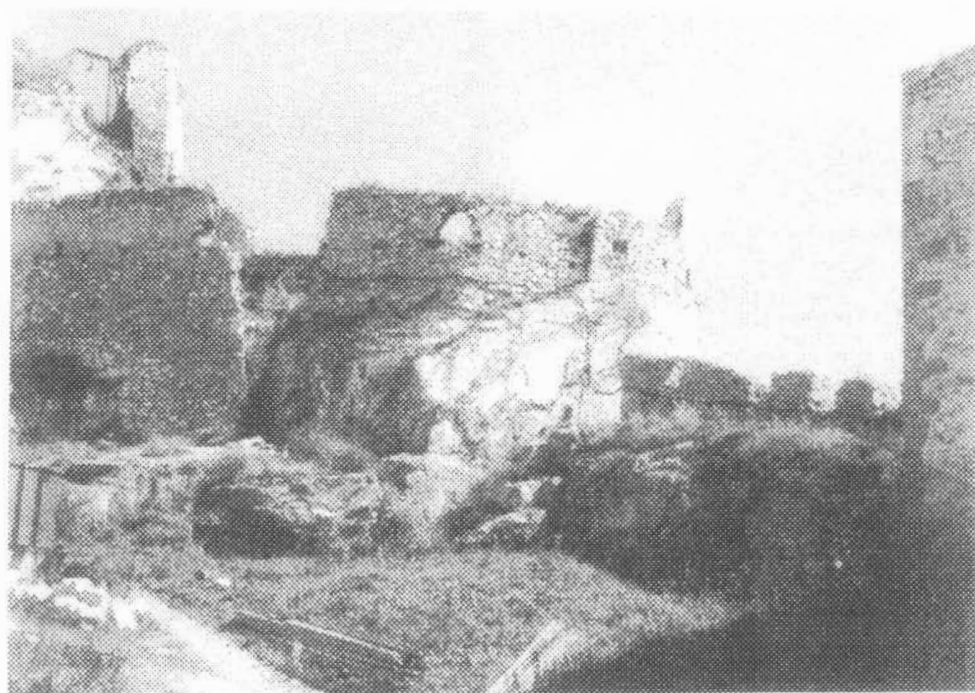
The wall crack N of the main Spiš Castle gate which was supposed to evidence movements of travertine blocks in the castle foundations. The crack separates a huge block of travertine called Perun Rock (right) from a stonemasonry wall (left), and indicates opening, transversal displacement and rotation of the Perun Rock. The first point of movement monitoring.
